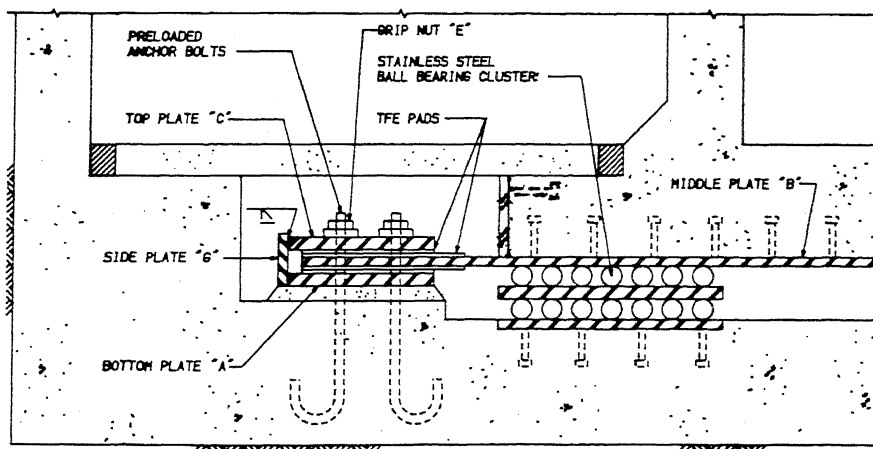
DETAILED CROSS-SECTION OF CONTROL PAD AND BALL BEARING CLUSTER
